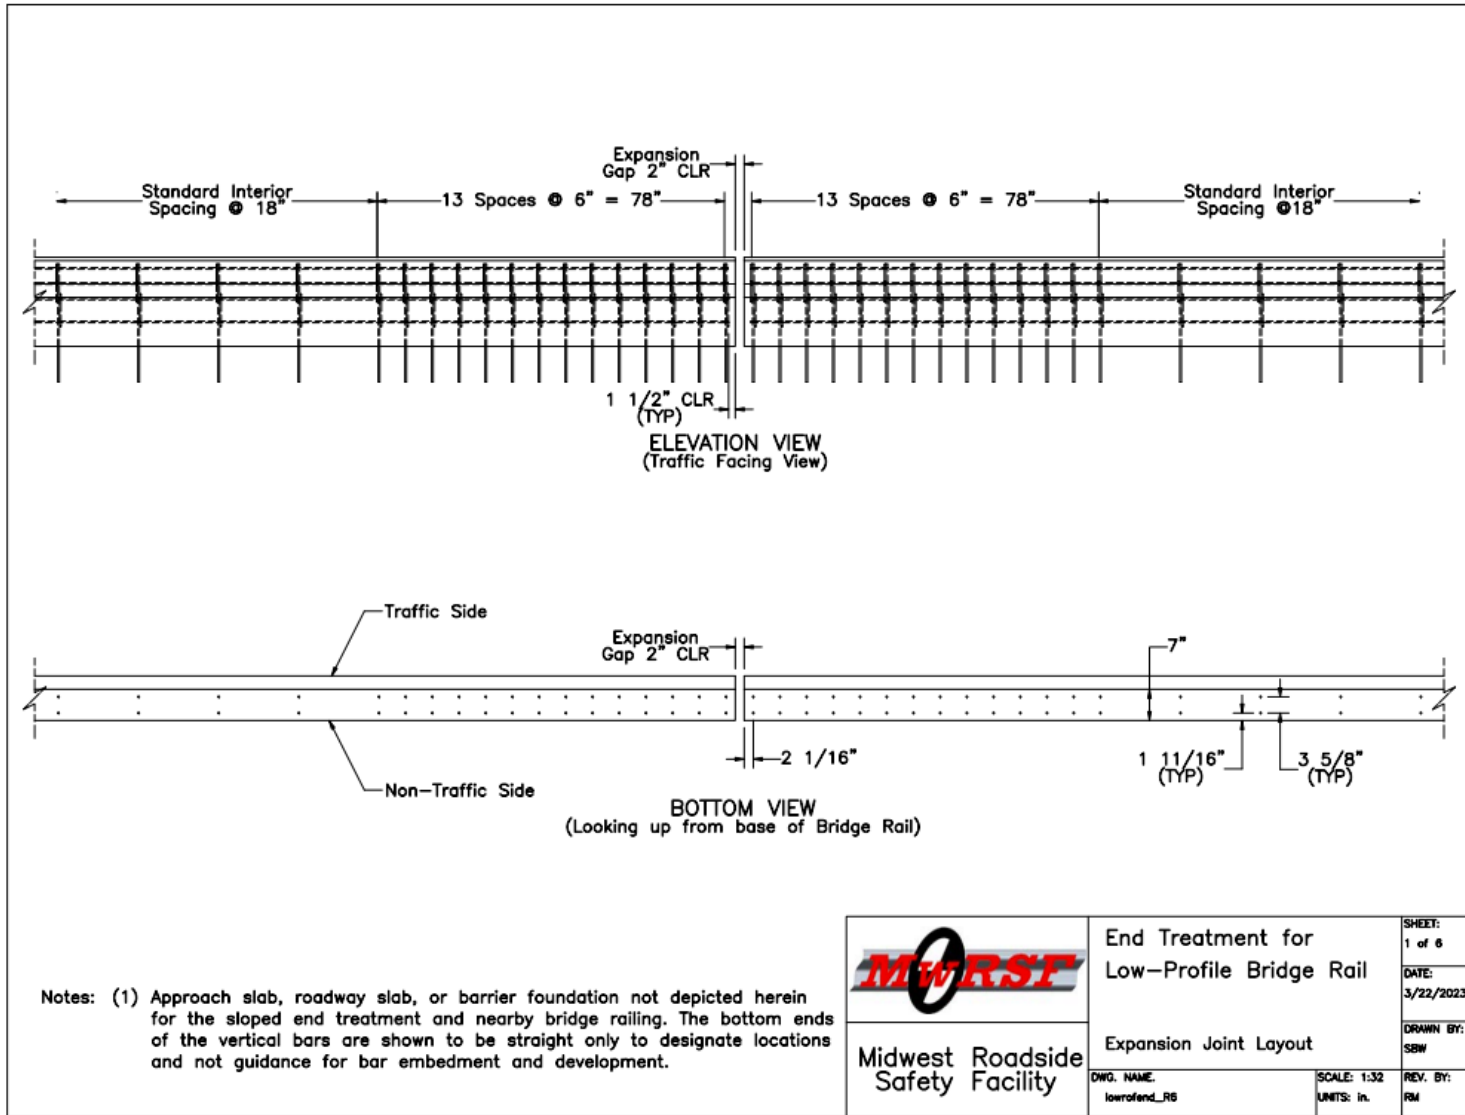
Modified NDOR Bridge Railing System, Expansion Joint Layout
